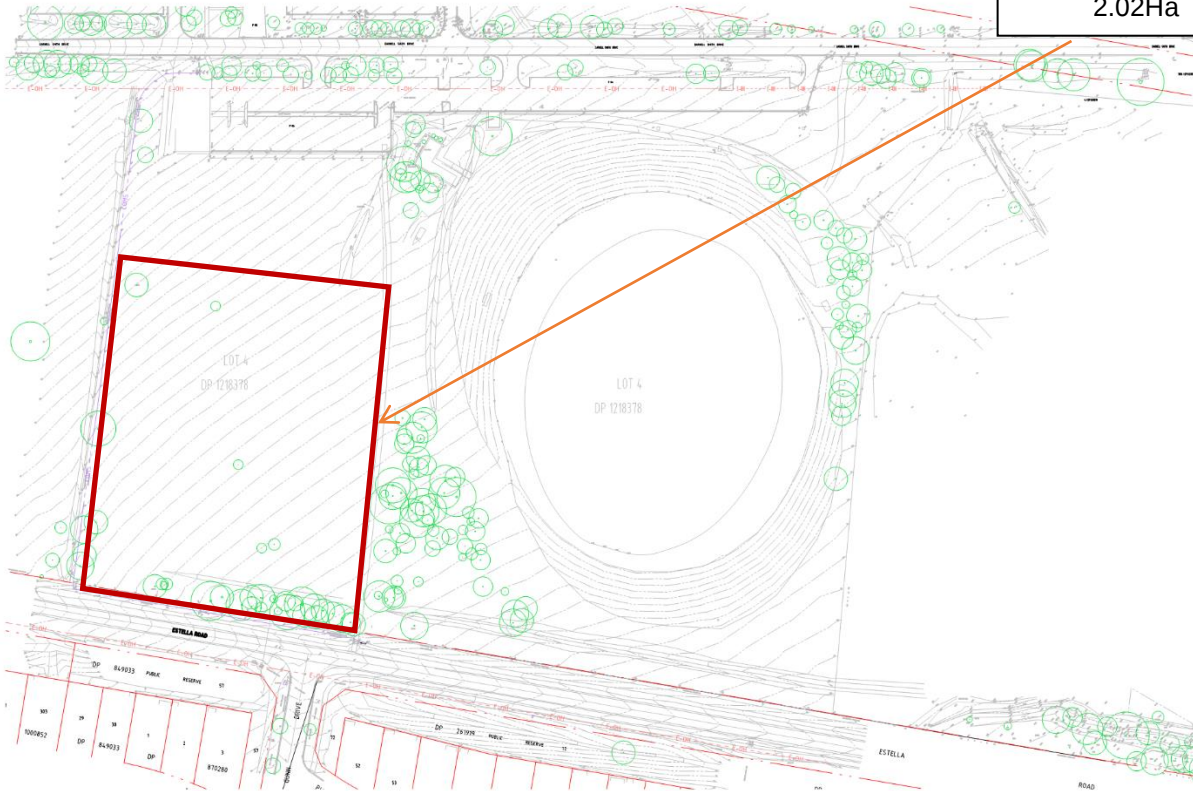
Catchment Plan of Subject Site under Existing/Pre-developed Conditions.
